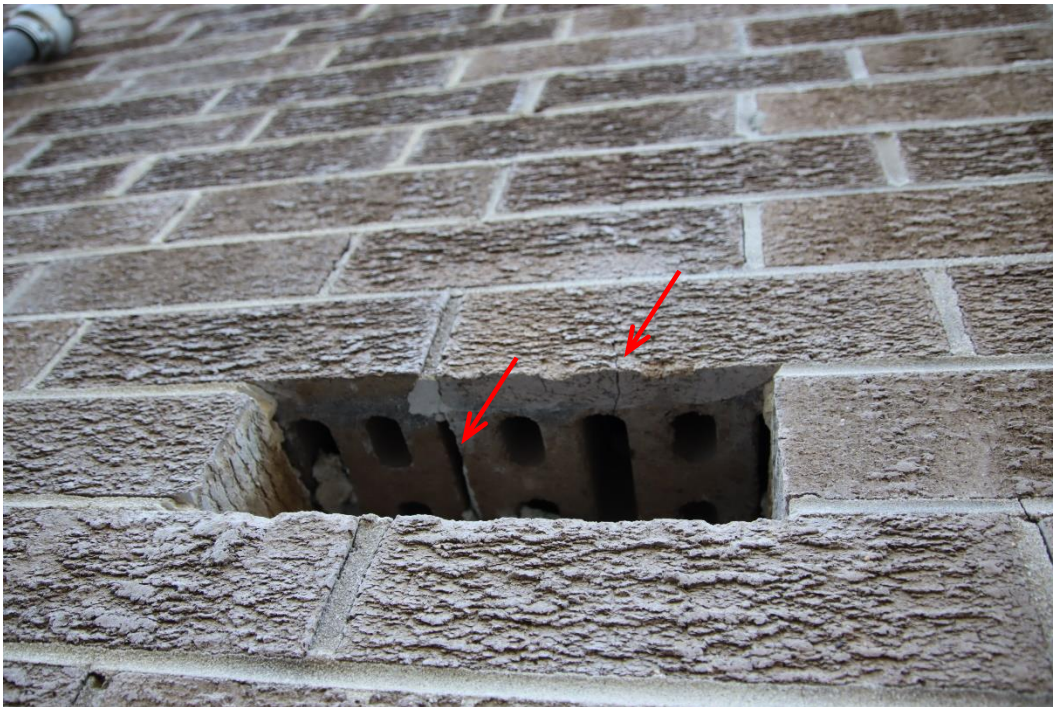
Exploratory opening #1. Voids in mortar at head joint, hollow cells of masonry units and crack in masonry unit
